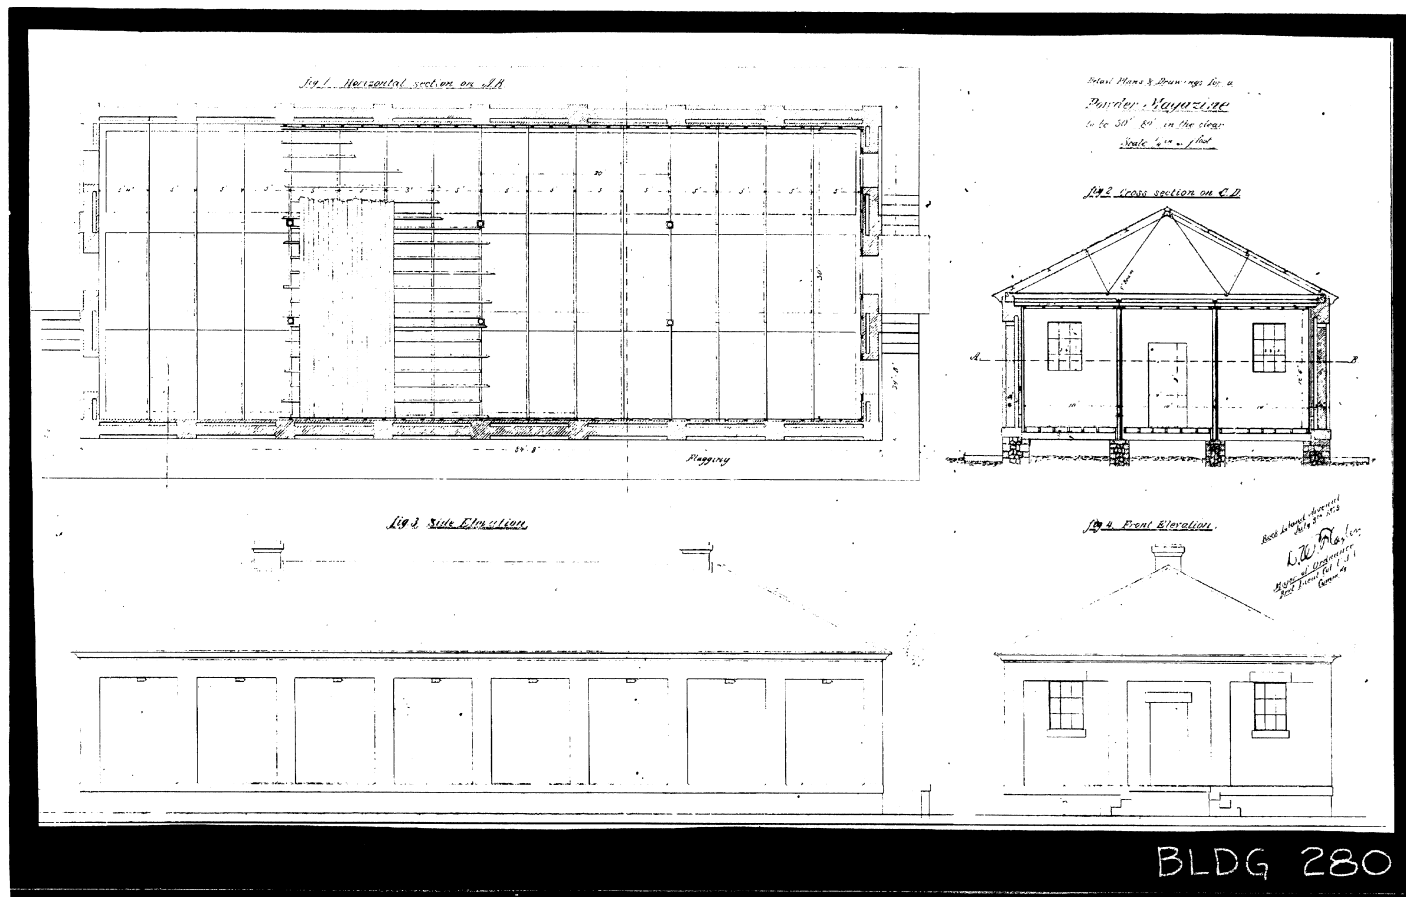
Detail plans and drawing for Powder Magazine (Building 280) at Rock Island Ordnance Center.
